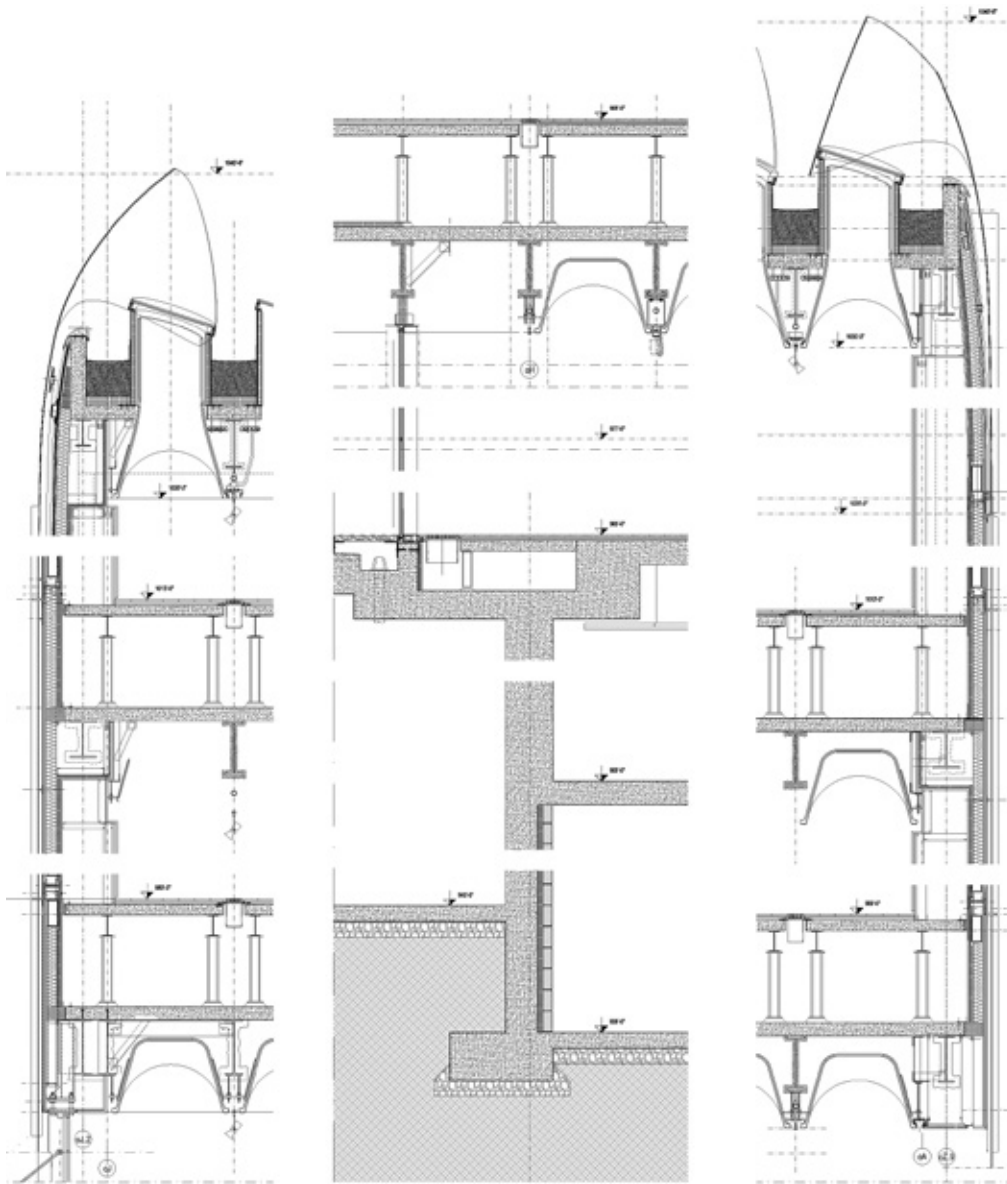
Renzo Piano Building Workshop's detail section through the gallery spaces
